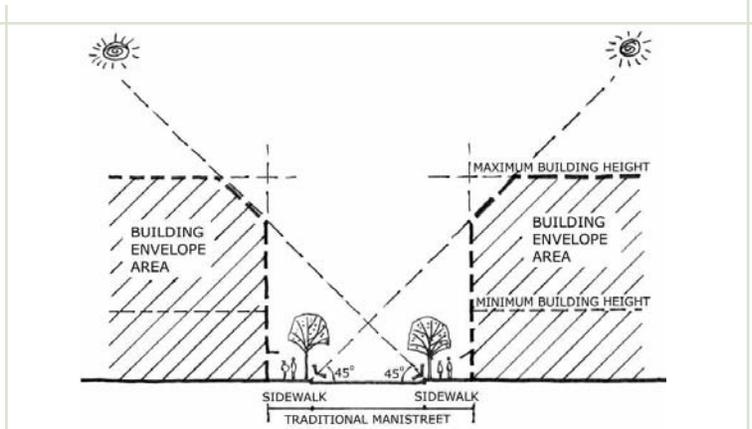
Building within sun angle envelopes helps ensure adequate light on mainstreet sidewalks.
